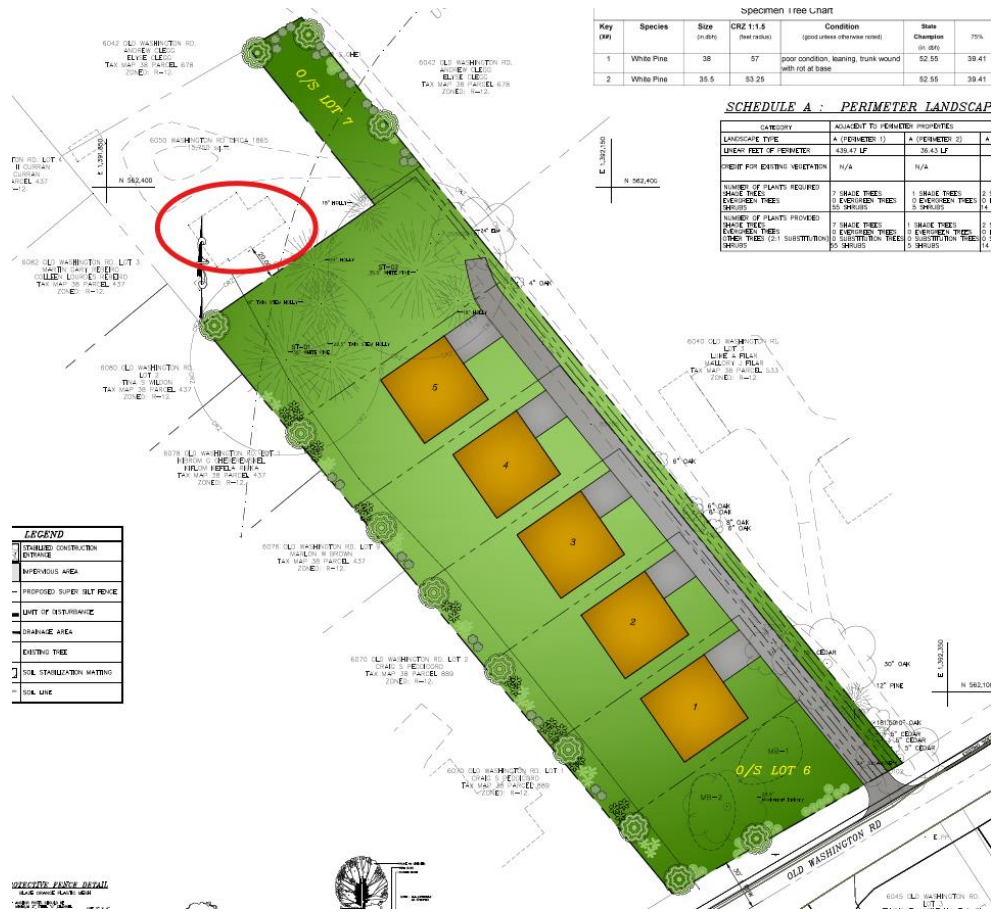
Proposed site plan showing 5 new houses. Historic house located behind new lots, within red circle.
